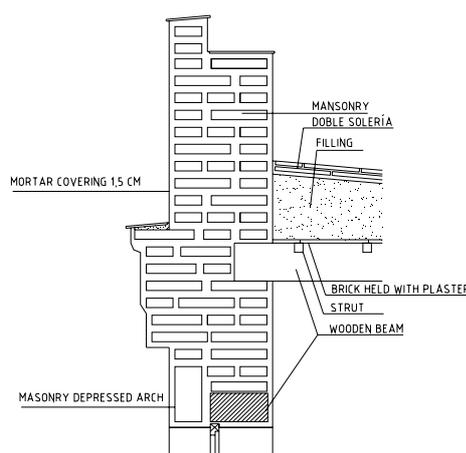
Constructive section of cornice from Alameda de Hércules st. 45 (Seville)
